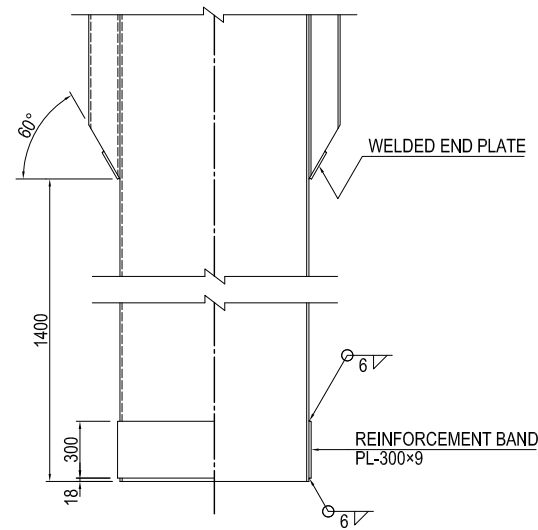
# DETAIL OF INTERLOCKING OF STEEL PIPE SHEET PILE OF P14 PIER
